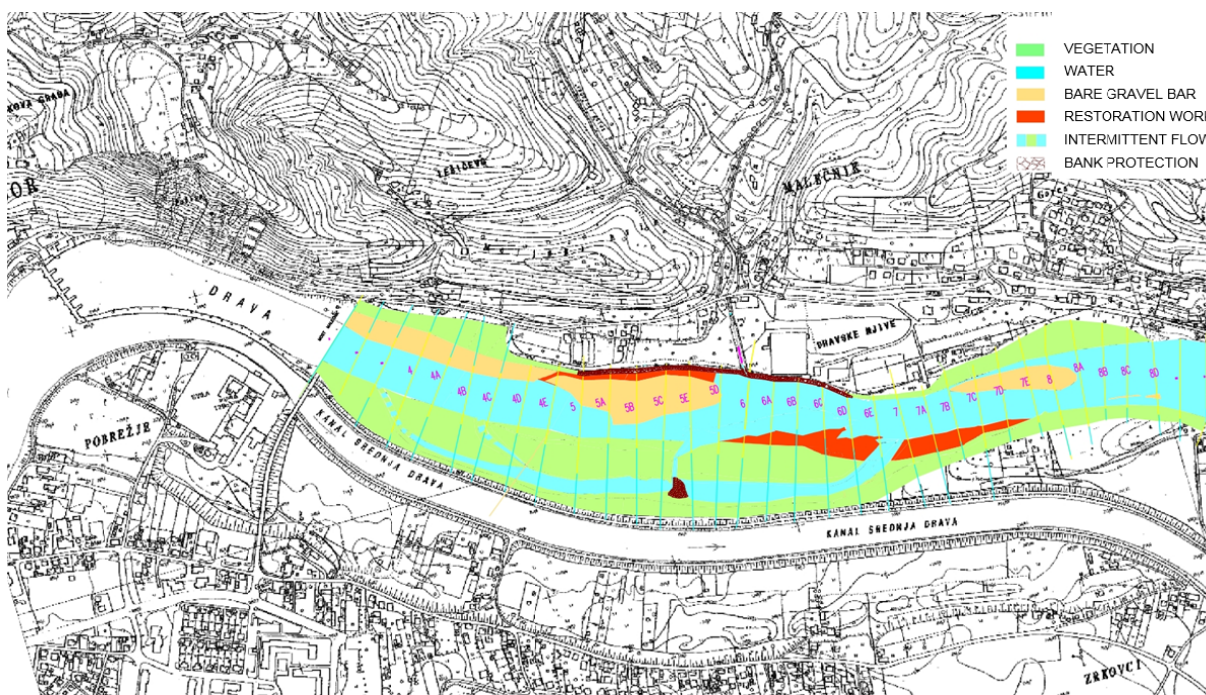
Restoration works at the gravel bar formation near the highway bridge columns (Malečnik)
